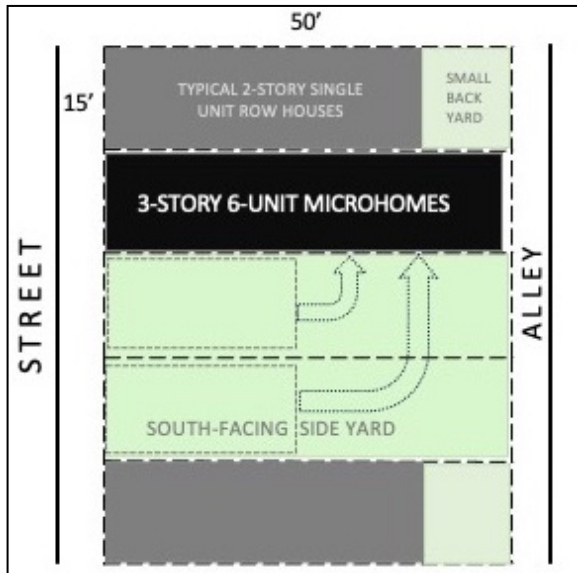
MT Concept Plan Diagram. Source: (Author 202)
